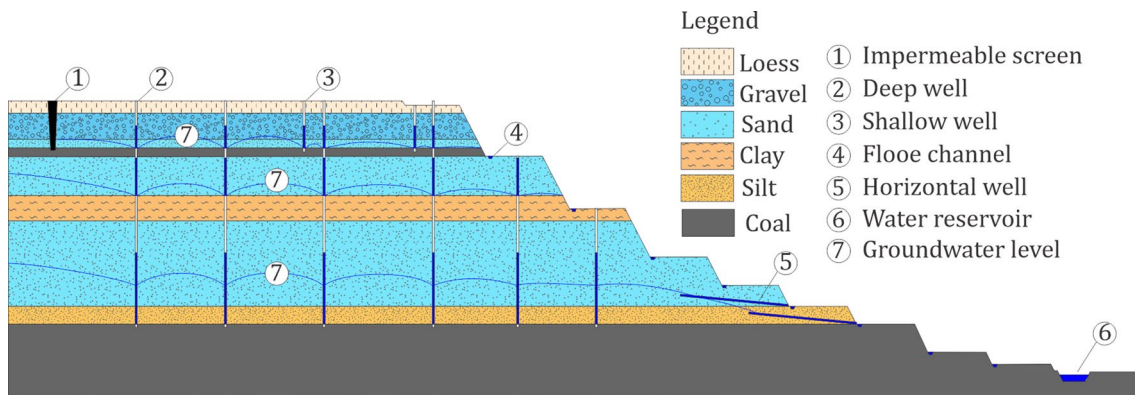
Water protection system of the open-pit mine Drmno (Serbia)
